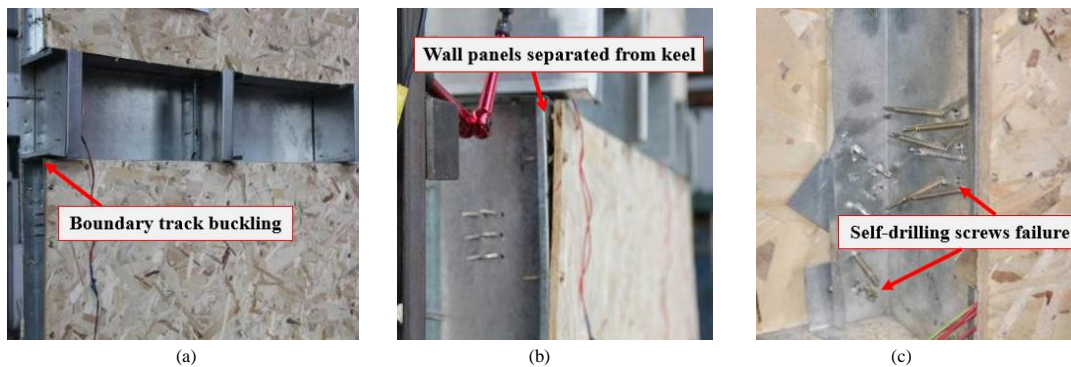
Failure phenomena of C group. (a) Boundary track buckling. (b) Wall panels separated from keel. (c) Self-drilling screws failure
